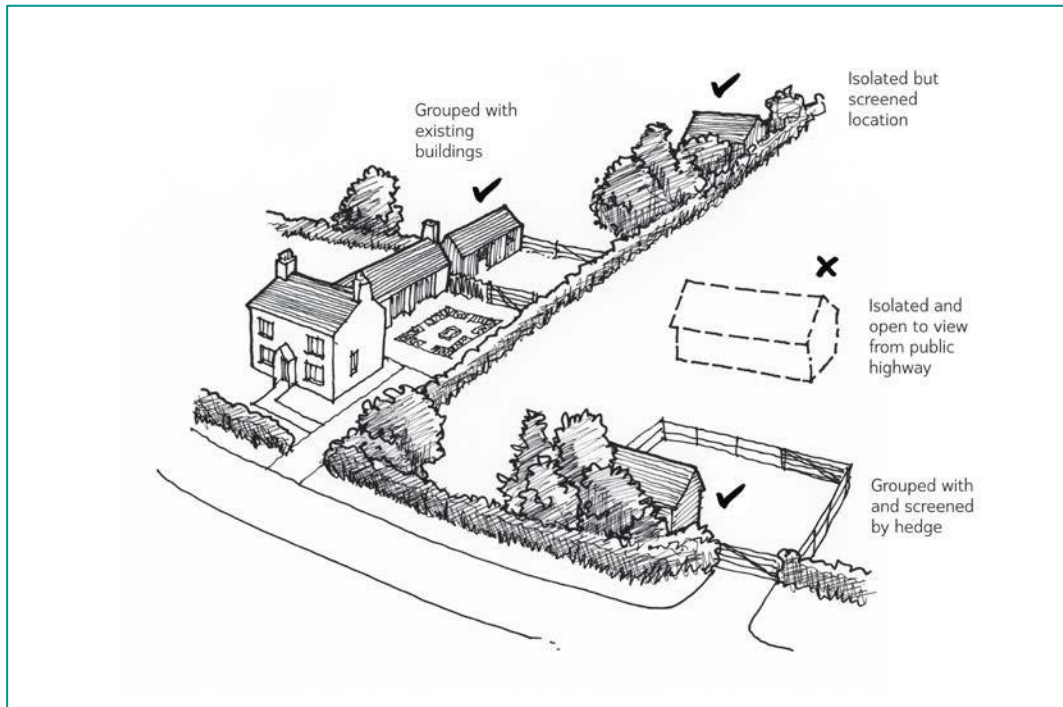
Good and poor examples of siting new equestrian buildings.
